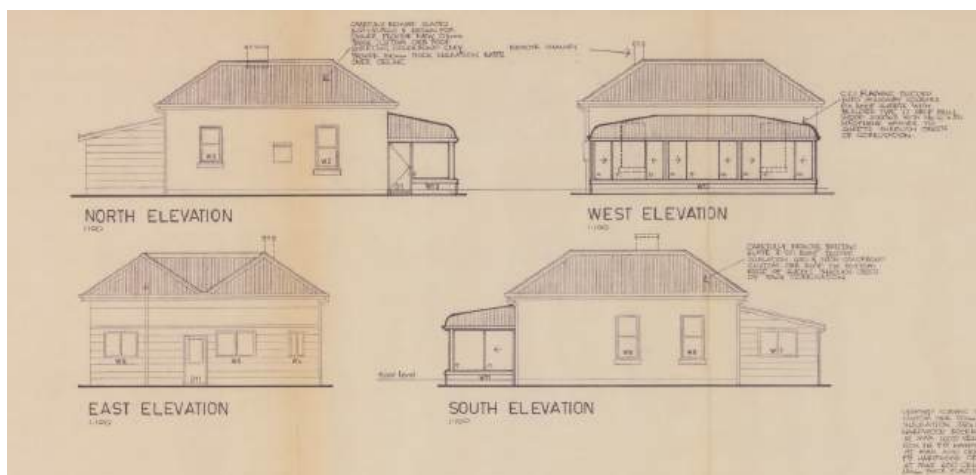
Architectural drawings showing design of new verandah, 1987 (Source: Ballarat City Council)
